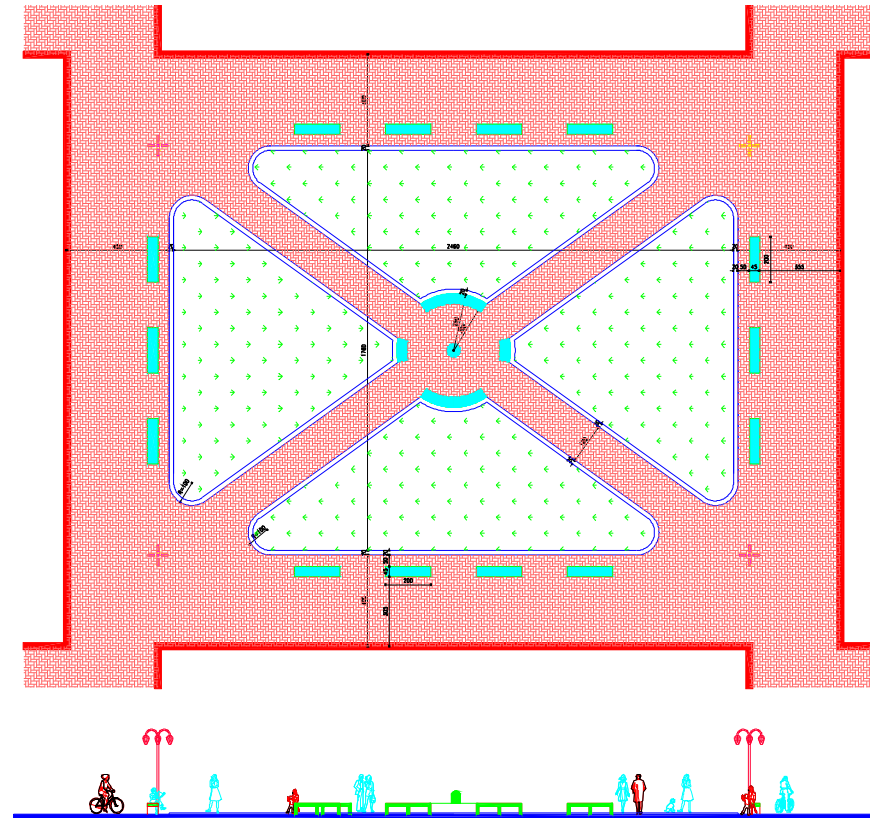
Plan detail of courtyards No. 1, No. 2 and No.3
